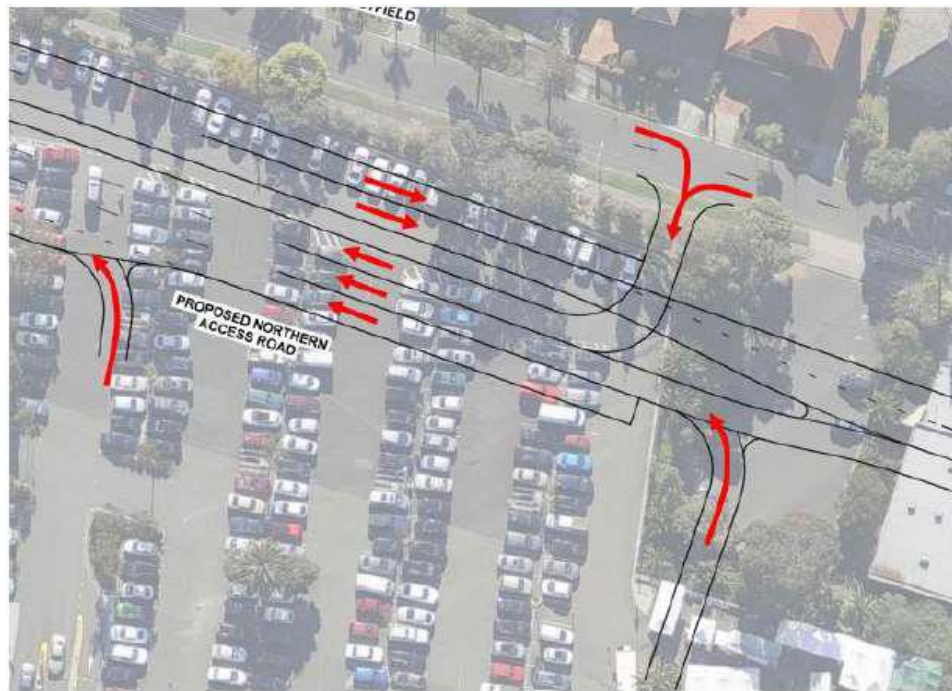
Configuration of proposed Westfield Drive Access and Proposed Northern Access Road
